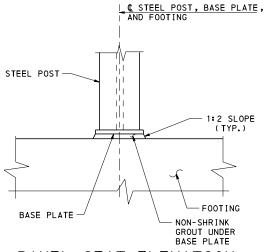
STEEL POST WITH BASE PLATE CONNECTION TO SPREAD FOOTING
